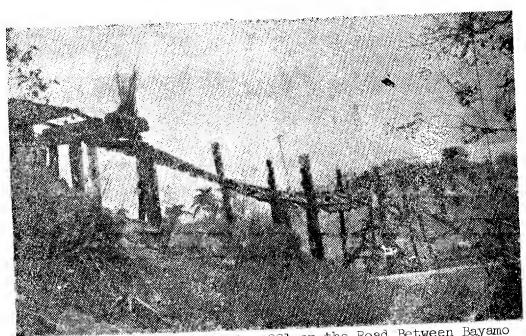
Bridge at Kilometer 221 on the Road Between Bayamo and San Luis. Another example of the damage done by the hurricane, the road suffered enormous damage in this area.
